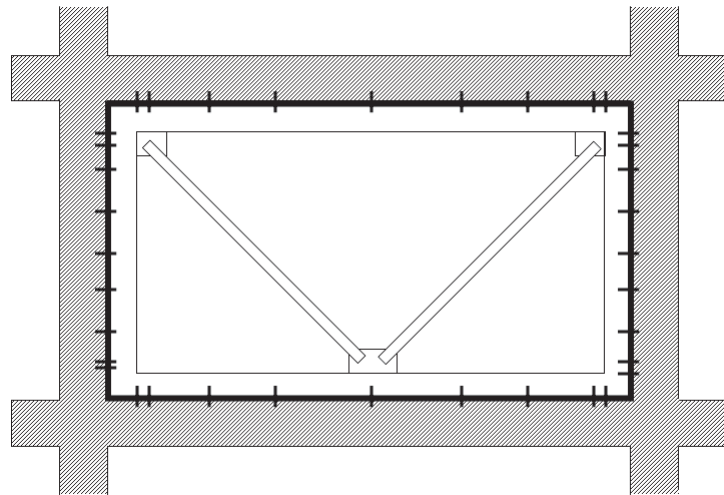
Detail of the frame retrofit with V-shaped steel braces in vertical section
